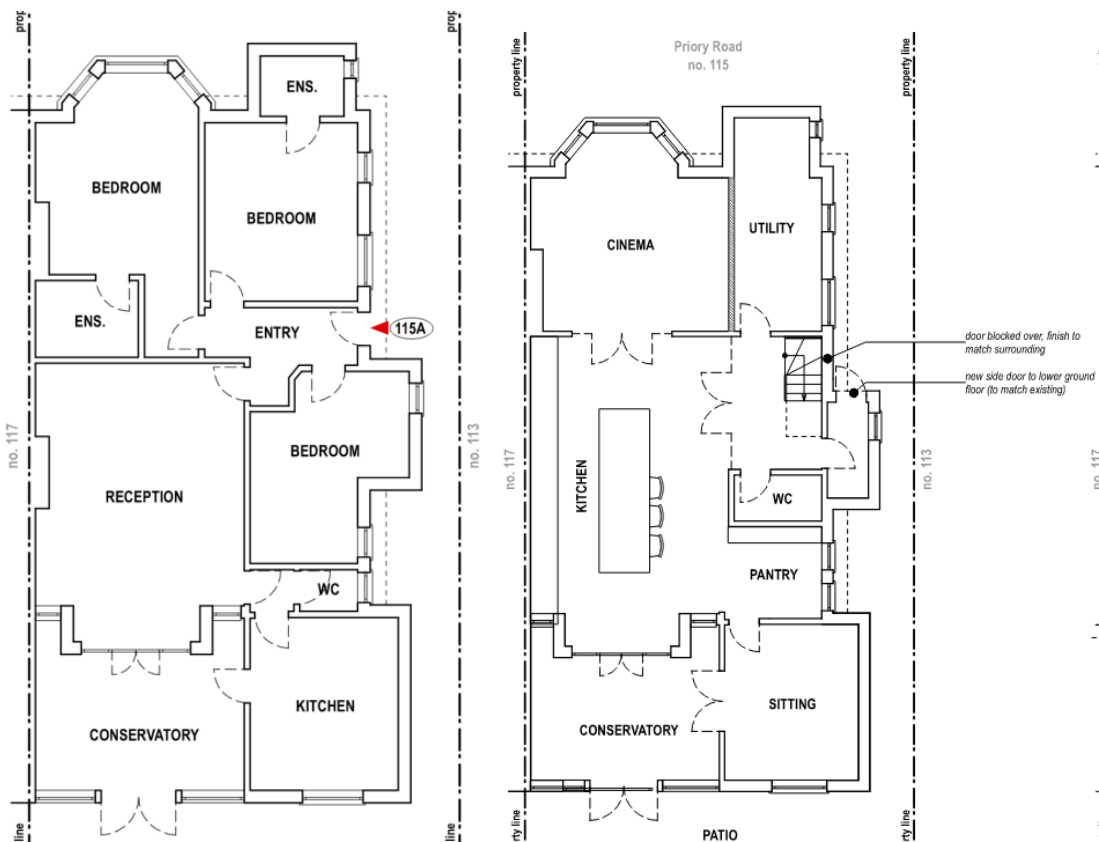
Existing (left) and proposed (right) lower ground floor plans.
